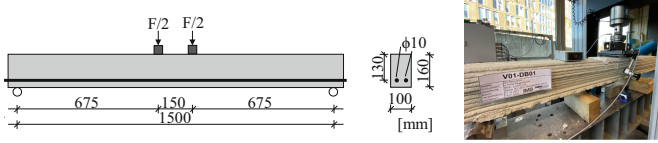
Test setup, geometry, and reinforcement of the specimens.
